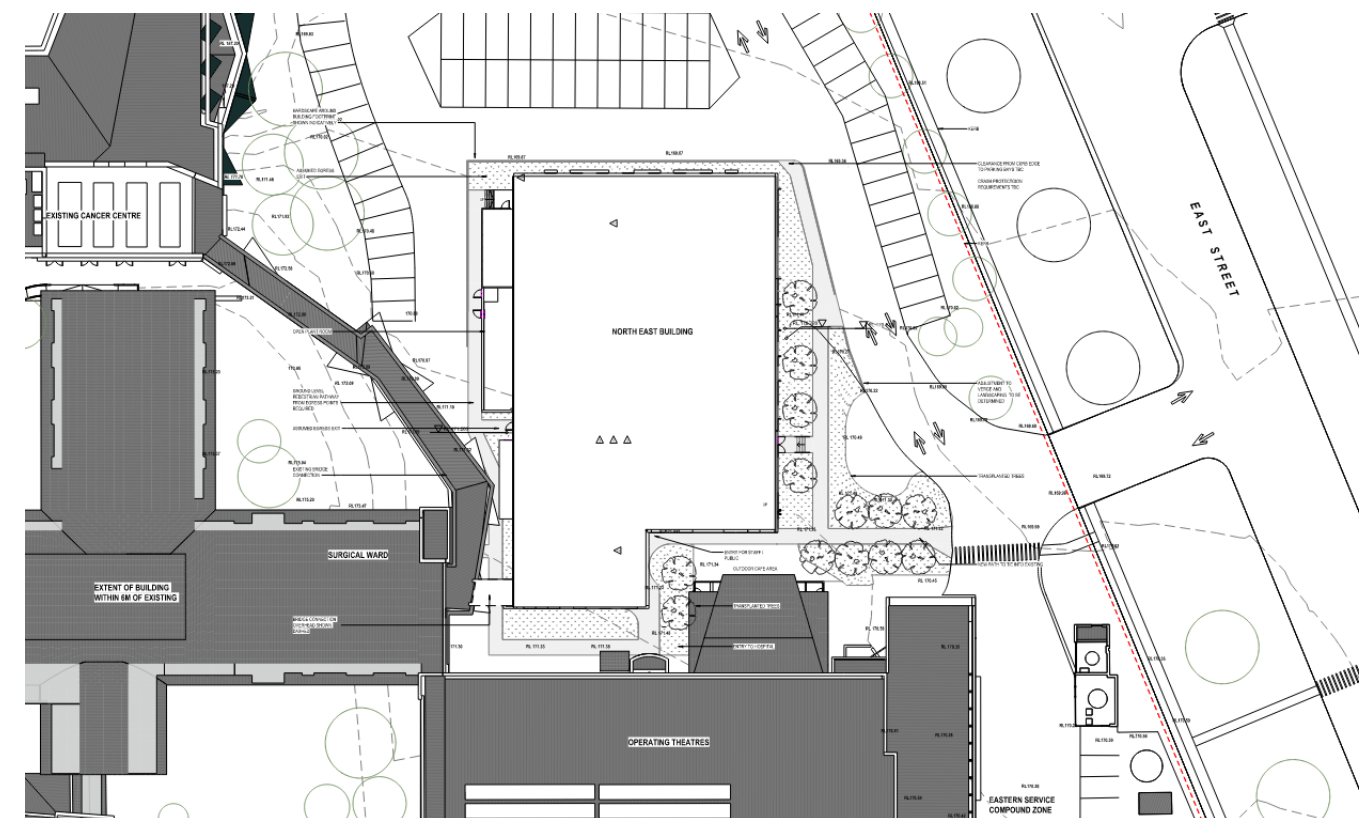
Proposed Northeast building location relative to the site (Source: Hassell)
